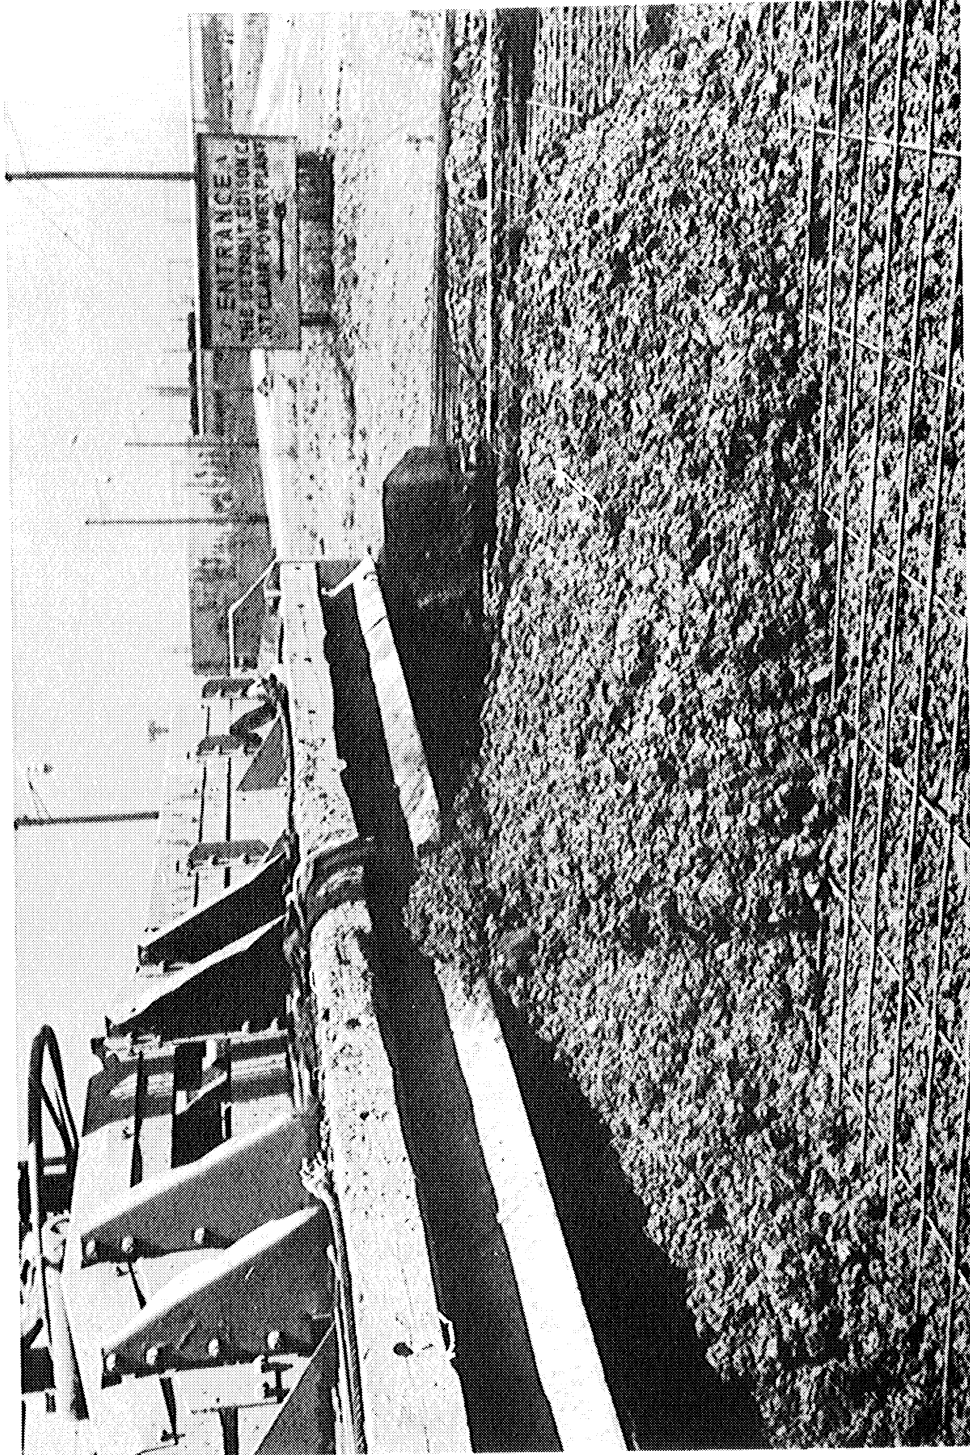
Plate II. The spreader distributes the fresh concrete over the full width of the pavement, leveling it to the approximate finished grade. Section 5.
